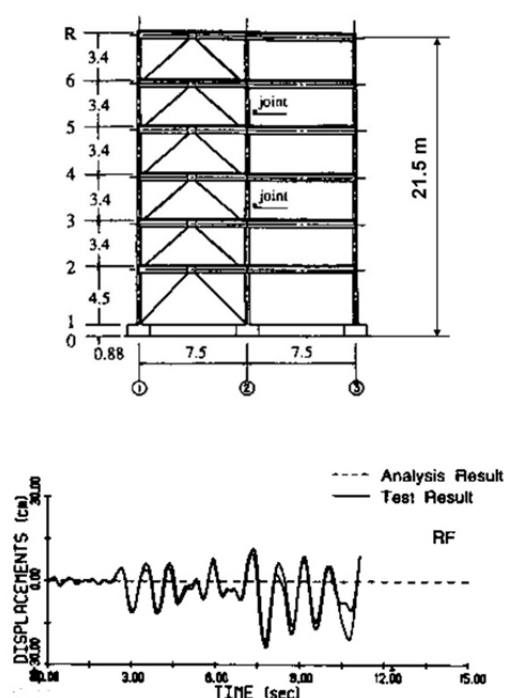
A full-scale six-story steel braced frame tested at BRI as part of US-Japan Joint Research Utilizing Large-Scale Testing Facilities. The upper drawing shows an elevation of the frame whose height is 21.5 m. The lower drawing shows a displacement time history of one of the test series. To simulate the ten second response, it took about five days because of intensive observation after each major step of loading.
